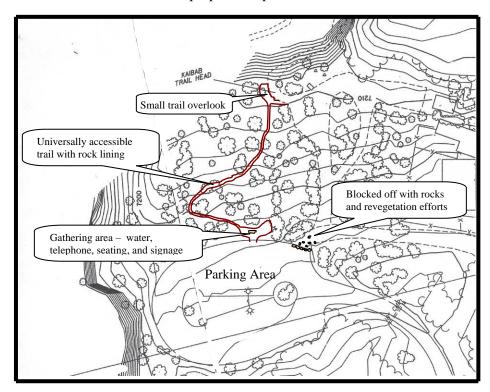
Pipe Creek Vista Parking Configuration Proposed Under Alternative B
